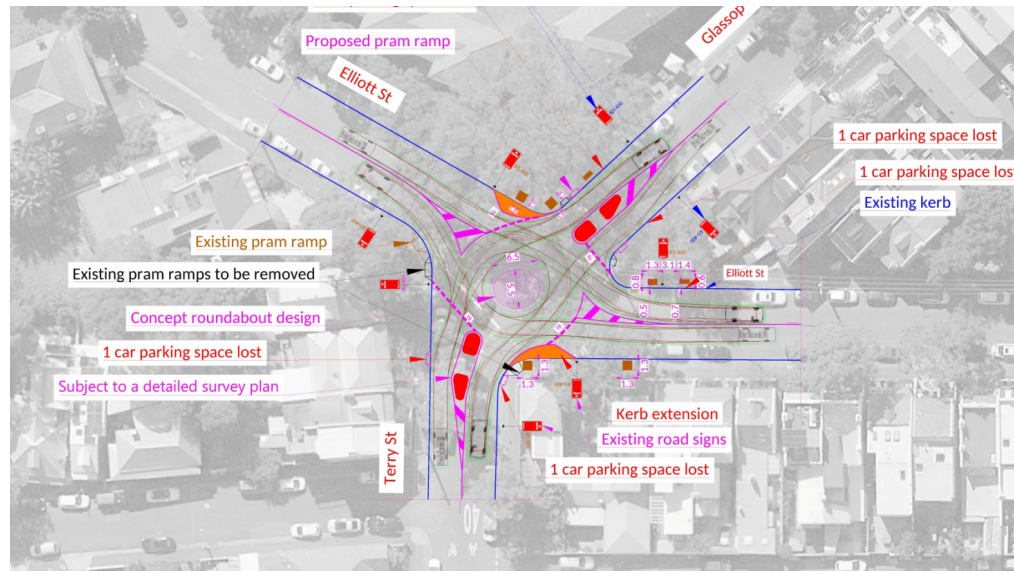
Terry Street / Elliott Street / Glassop Street intersection proposal
